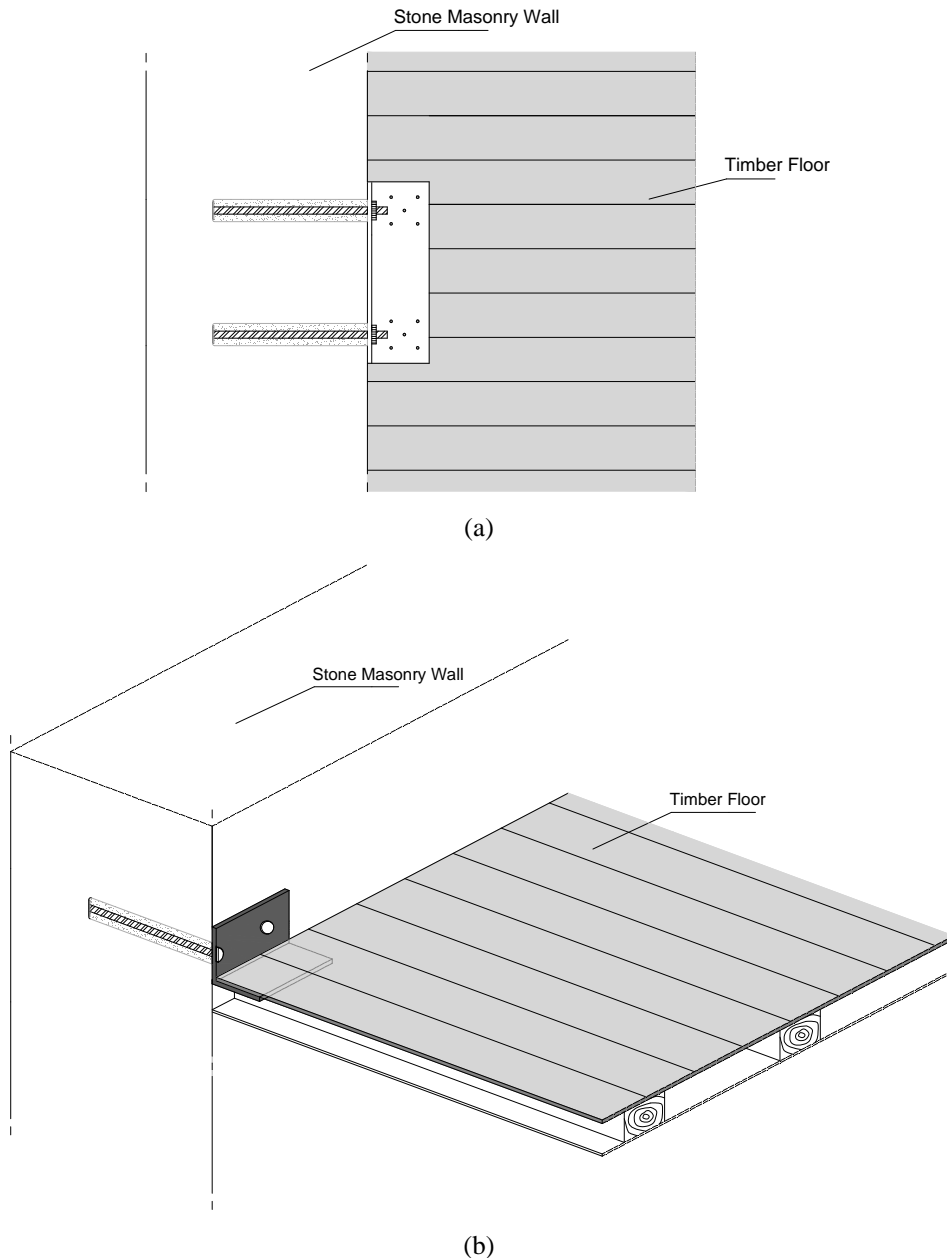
Wall-to-floor strengthening solution: (a) Plan view; (b) Perspective.
